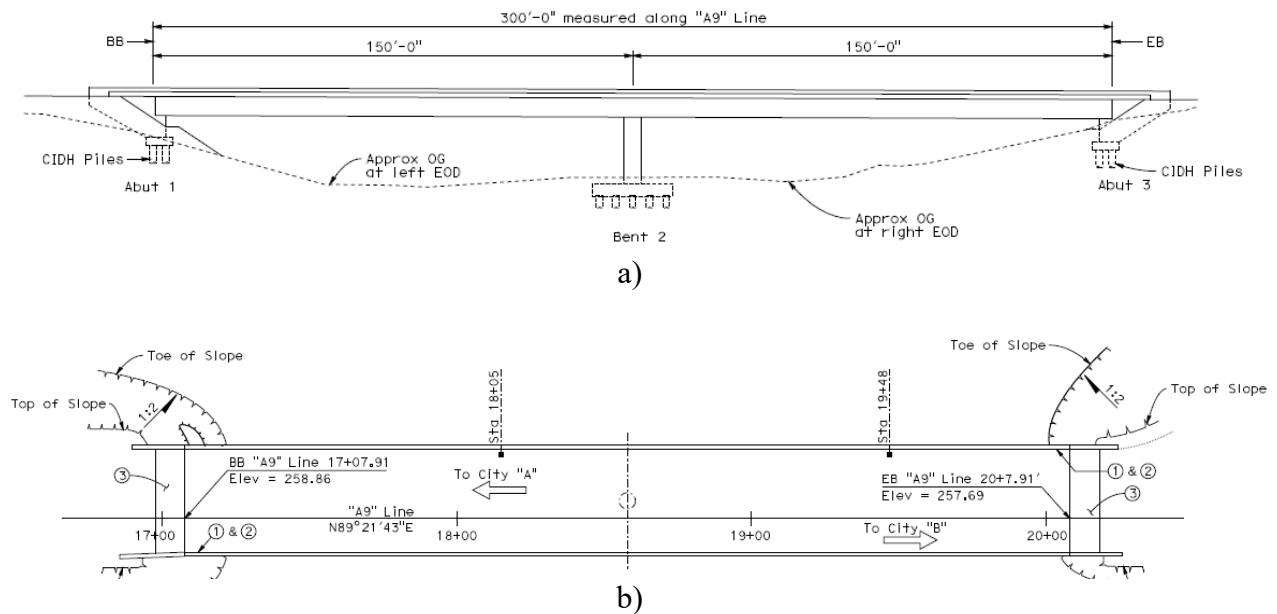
Schematic of OSB2 (drawings provided by Caltrans): (a) Elevation view; (b) Plan view
